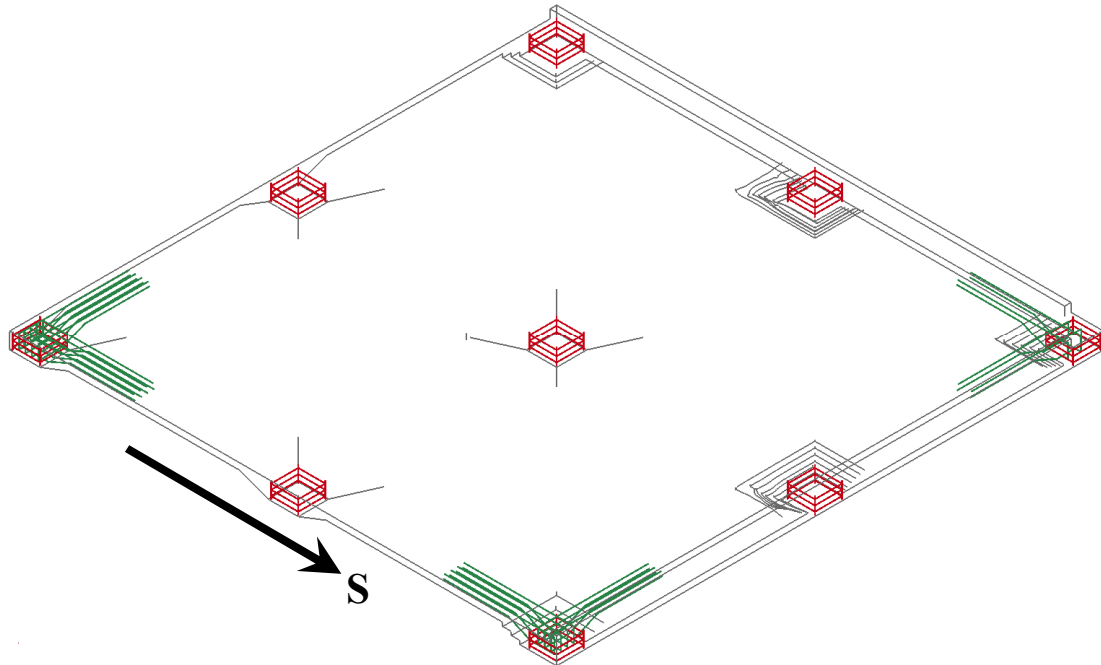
Isometric view of the extra reinforcement provided in the slab, red - #3 cage at support locations, and green - extra #3 rebar at push locations. An outline of the concrete model is shown in grey.
